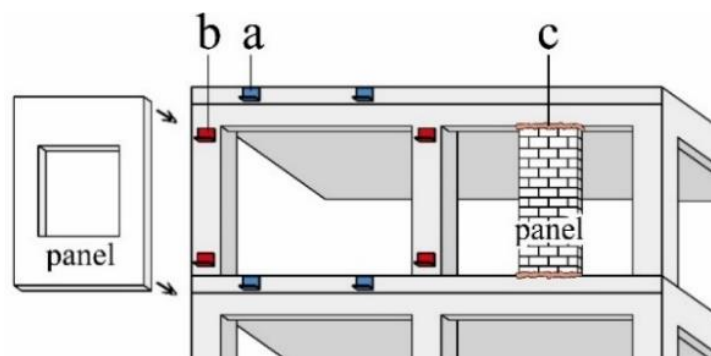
Dry and wet connection of prefabricated facade panels to the building structure
